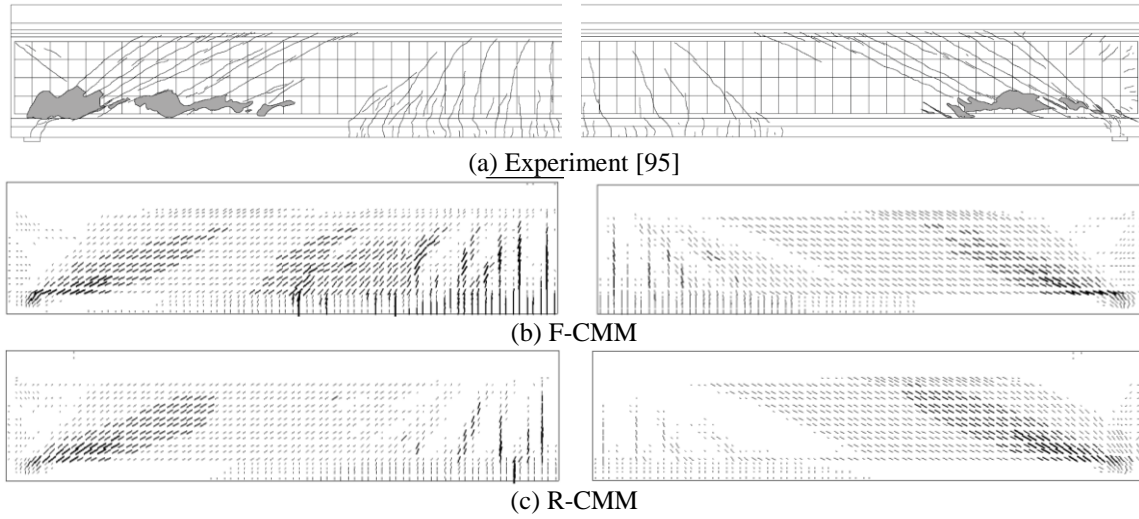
Beams G1W (left) and G1E (right): cracking patterns at failure.
